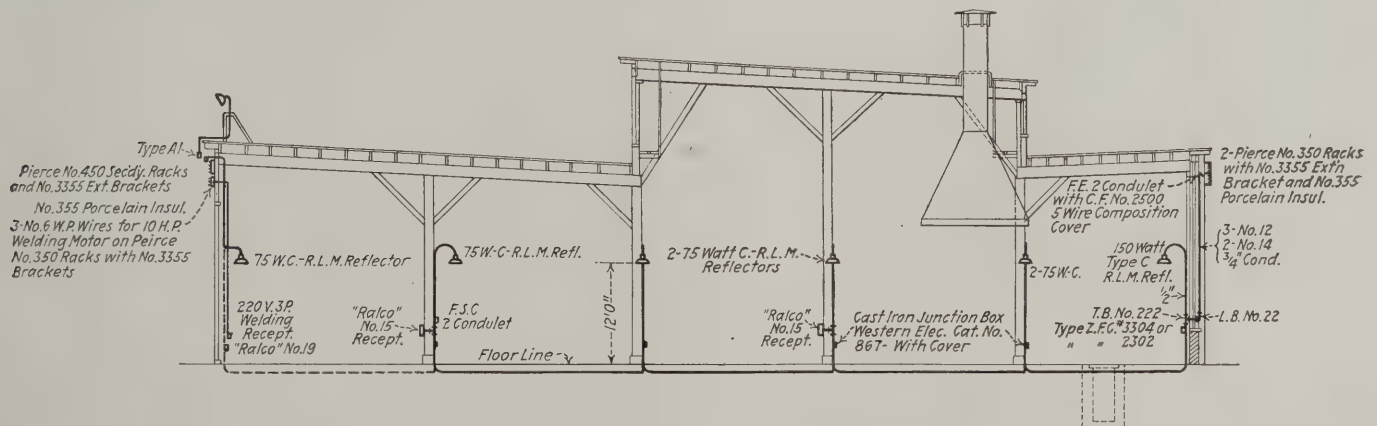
Cross Section of Enginehouse Showing Location of Lighting Units, Extension Outlets, Switches, Welding Outlets and Feeders
